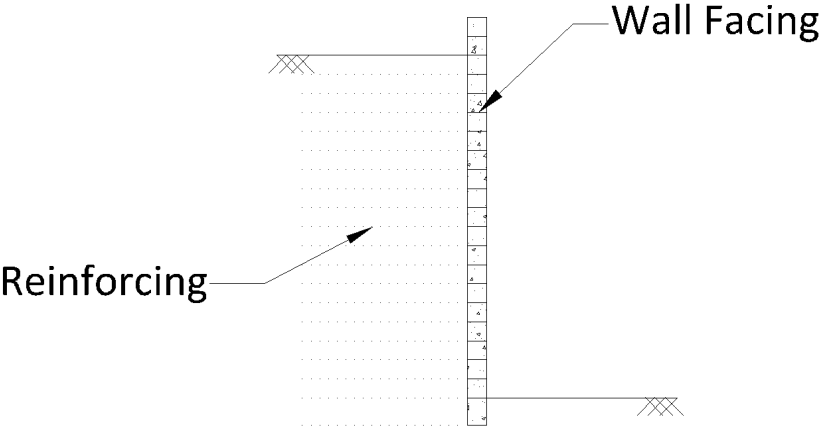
Schematic drawing of a mechanically stabilized earth wall
